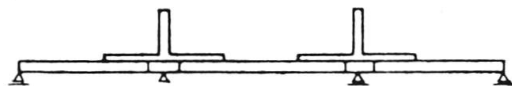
Steel Prestressed Concrete Erection Method (SPC Method)
